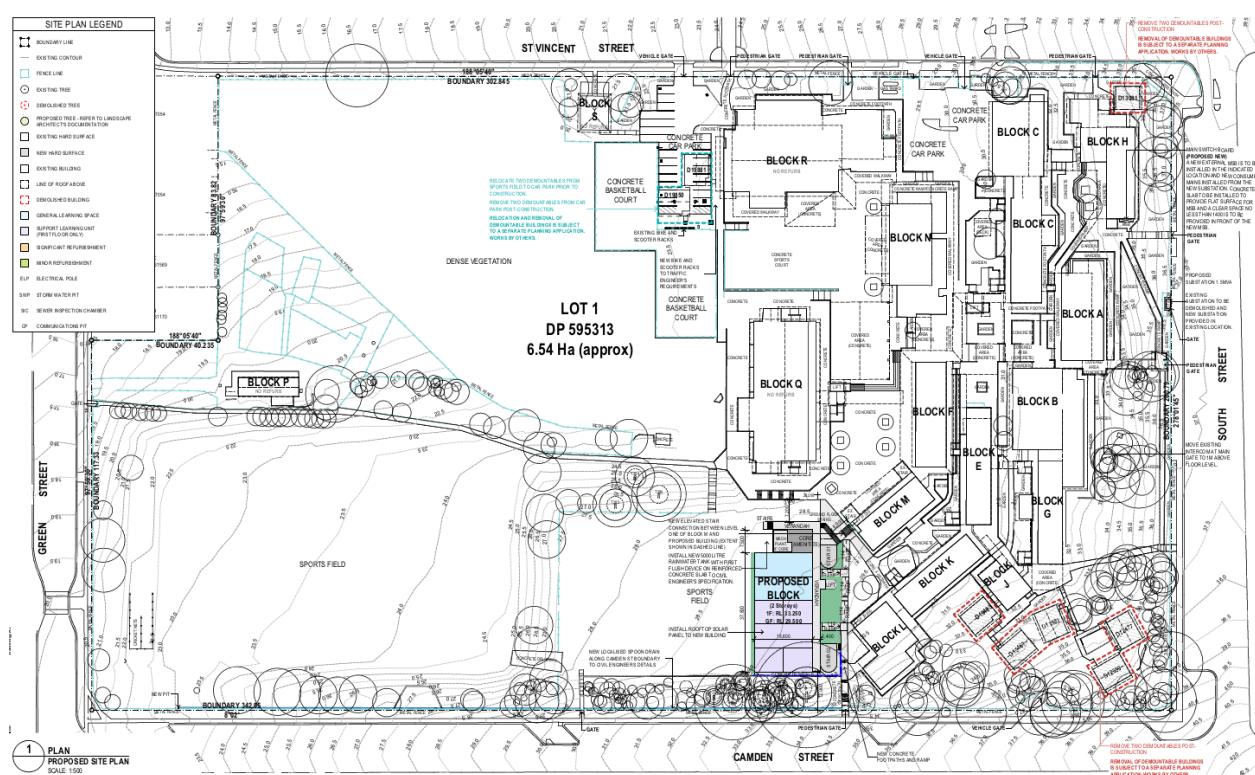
Site Plan (Source: Fulton Trotter, dated March 2025)
